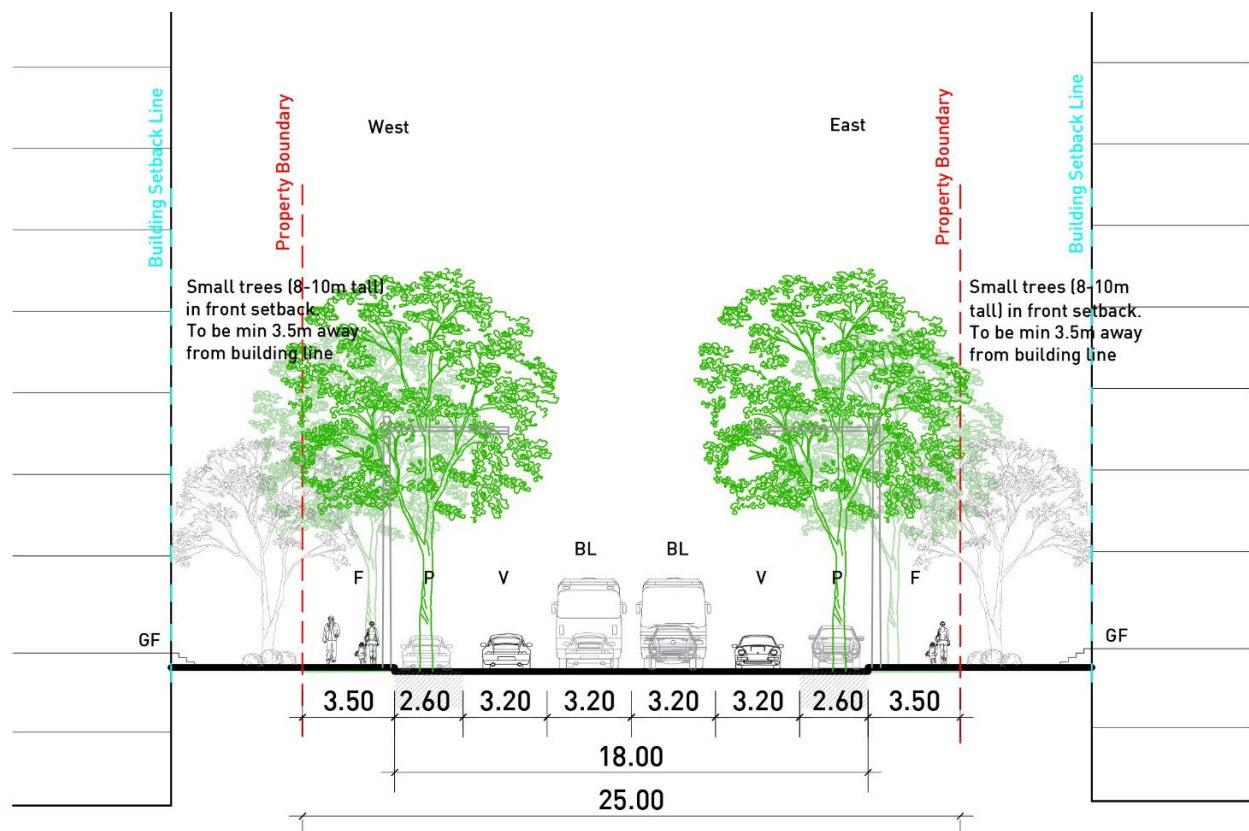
Type 1A Major Road Building to Building (NSR 2)
